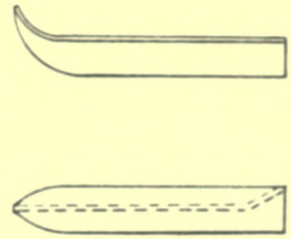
Elevation and Plan of T-iron Bracket for Pipes.
